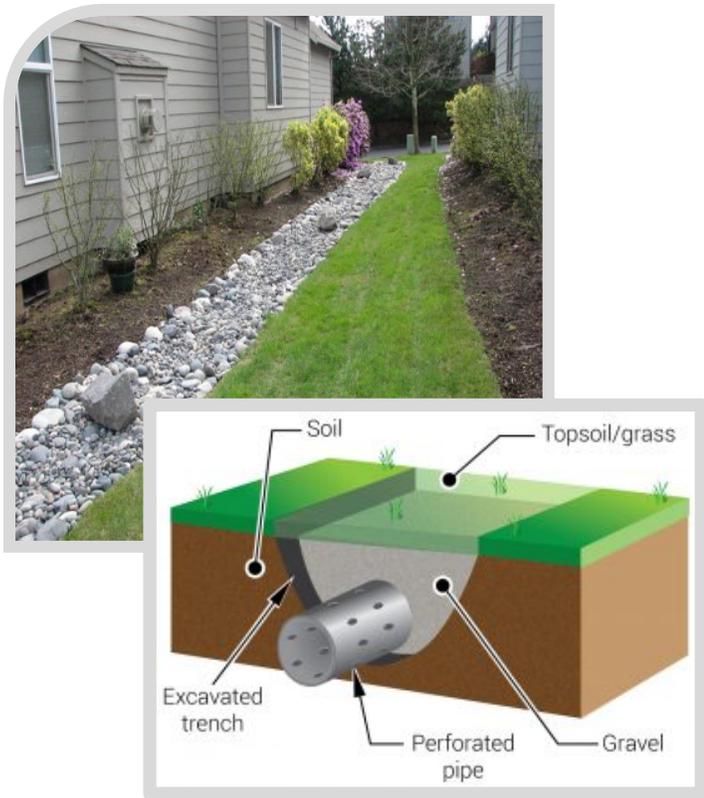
French Drain Details. Sources: Neave Stormwater and engineeringclicks.com
